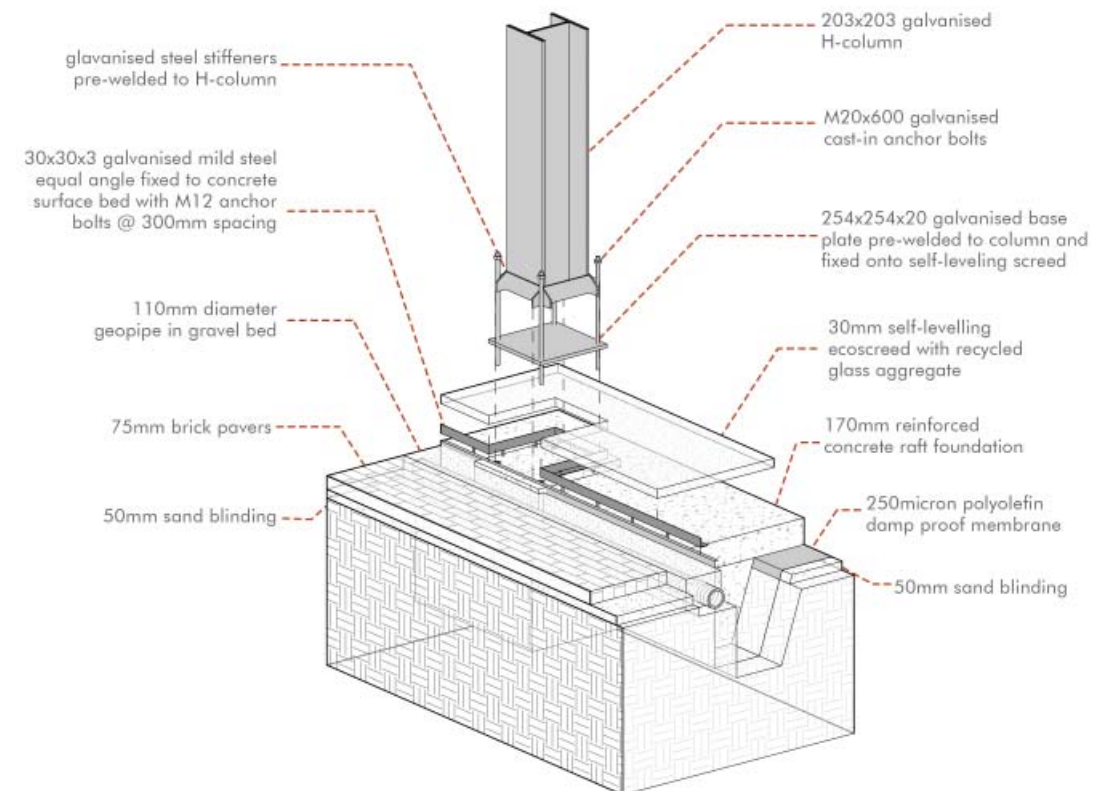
Column base and slab edge detail, development scale 1:20 (author 2017).
